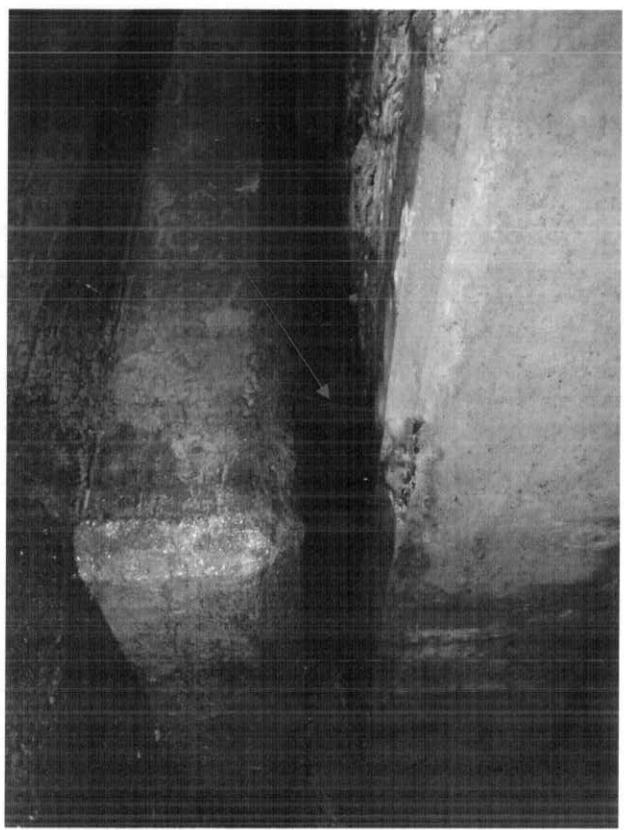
TYPICAL LONGITUDINAL CRACKING IN GIRDER BOTTOMS IN SPAN # 2.
